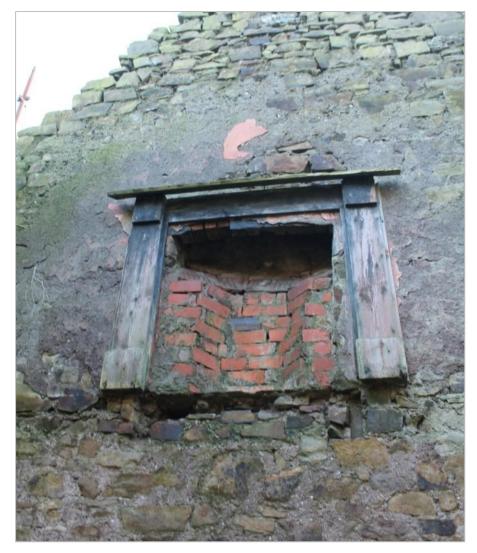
The first floor fireplace in the southern gable end (DAT Photo 110325_0026)
